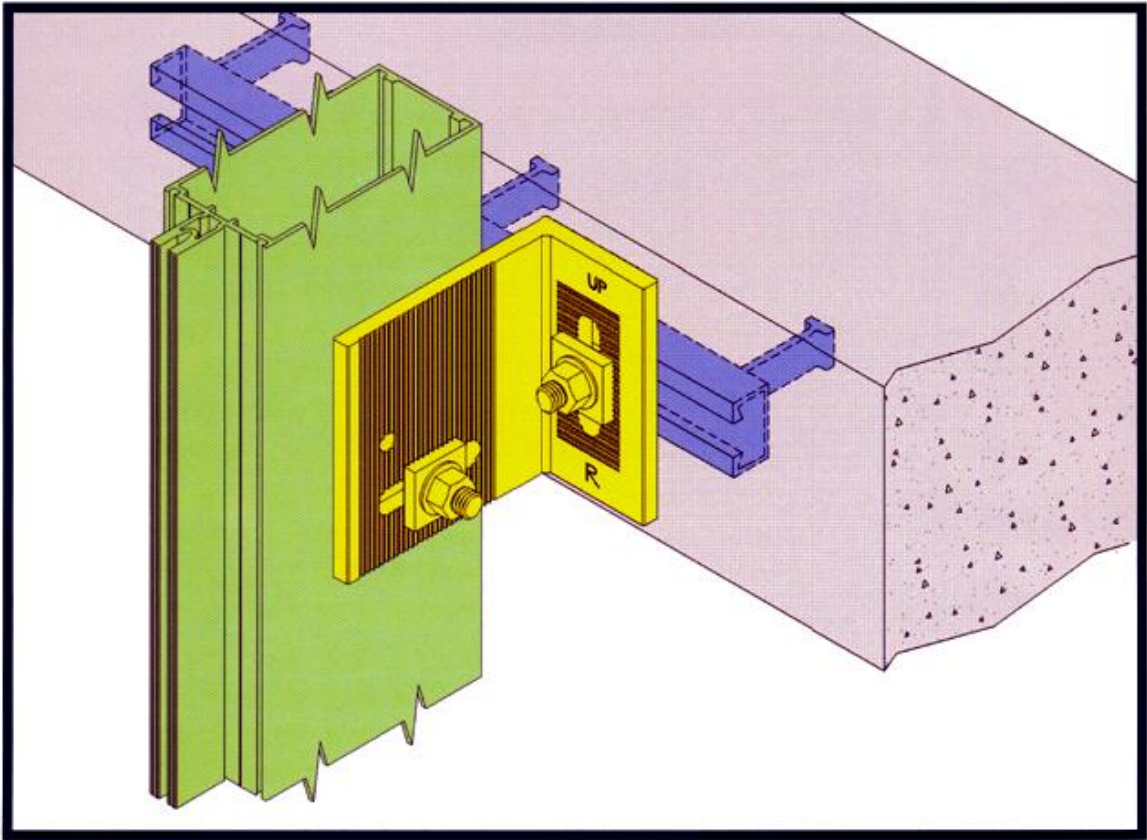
View of typical cast-in-place channel embed (edge of slab) with bolted anchor clip assembly where the clip is multi-adjustable (www.halfenusa.com)
